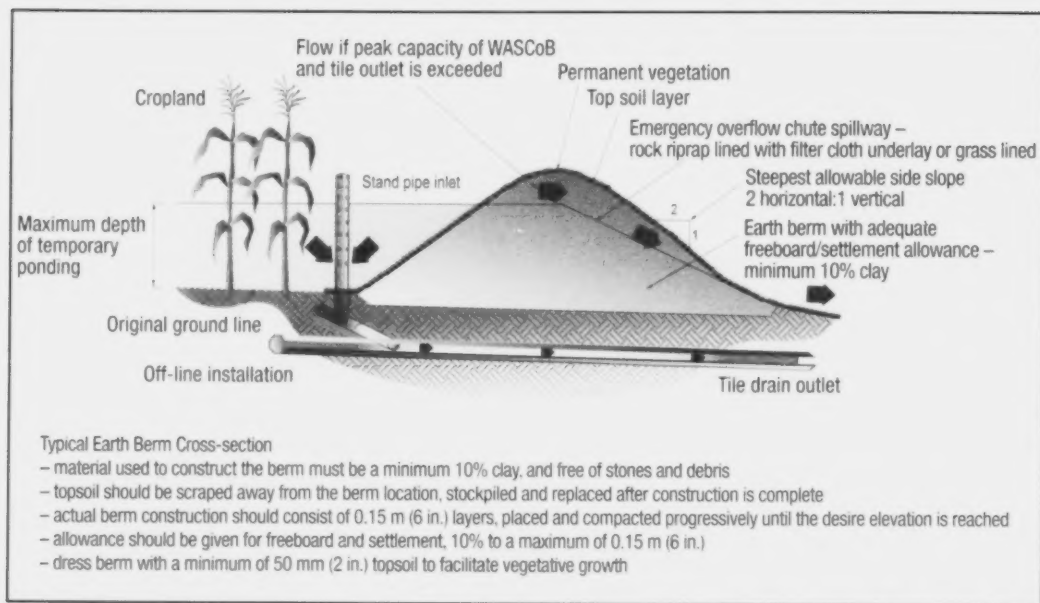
Typical Water and Sediment Control Basin (WASCoB) Cross-section
